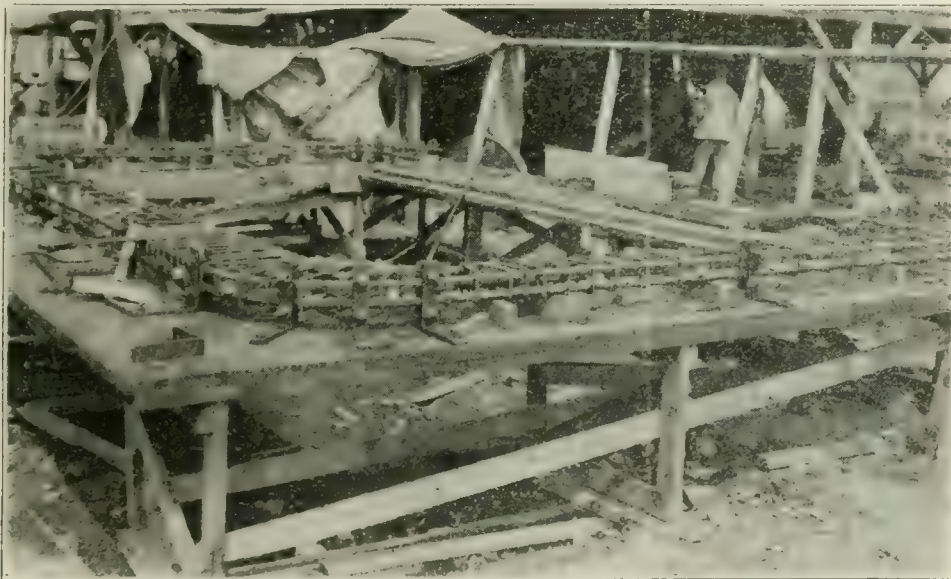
MAIN FRAME STEEL FABRICATED ON TABLE, DETROIT.
